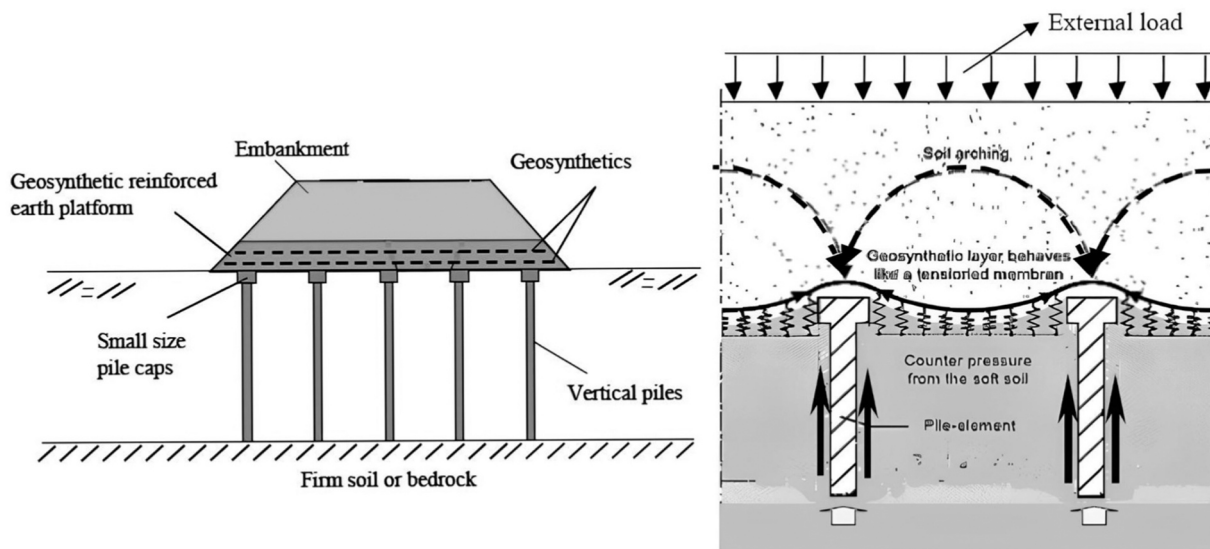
Scheme of the arrangement of Geosynthetic-Reinforced-Pile-Supported (GRPS) (photo from [17]).
